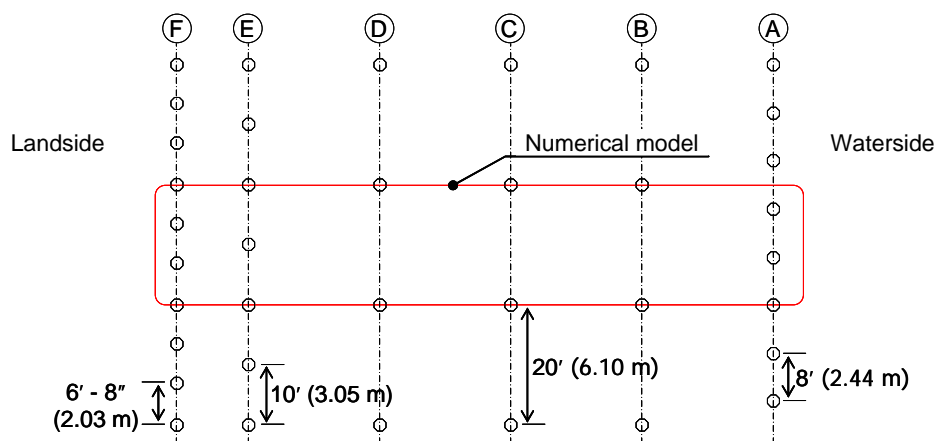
Pile layout of Berth 100 at the Port of Los Angeles
